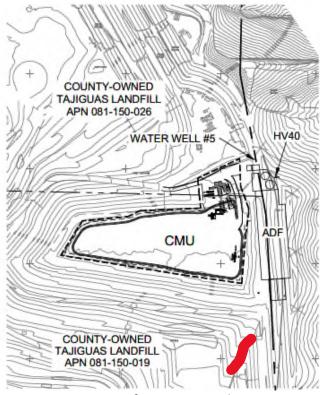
Locations of Fire Damaged Storm Drain
